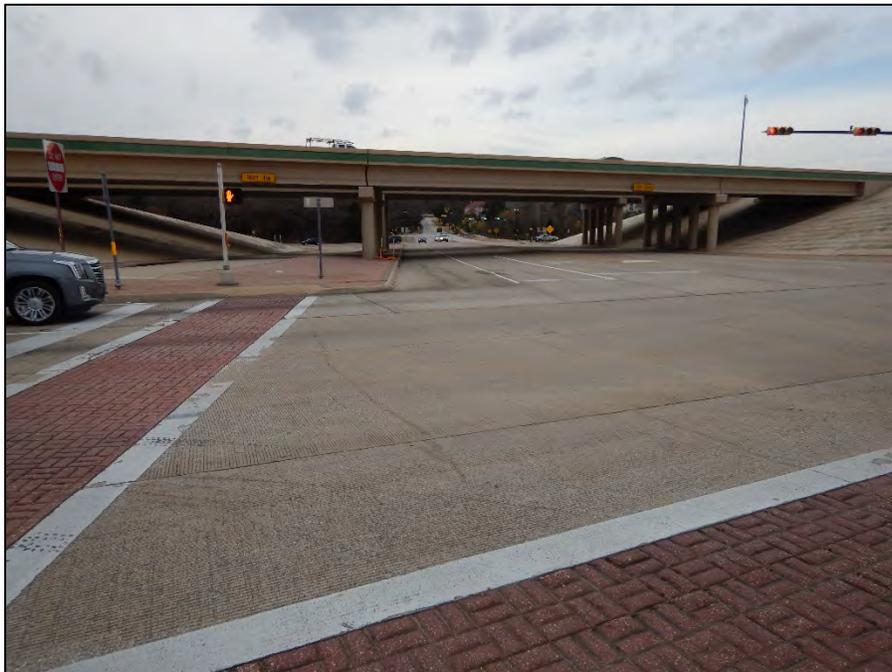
SH 114 WESTBOUND FRONTAGE RD. INTERSECTION AT DOVE RD. VIEWING WEST.
